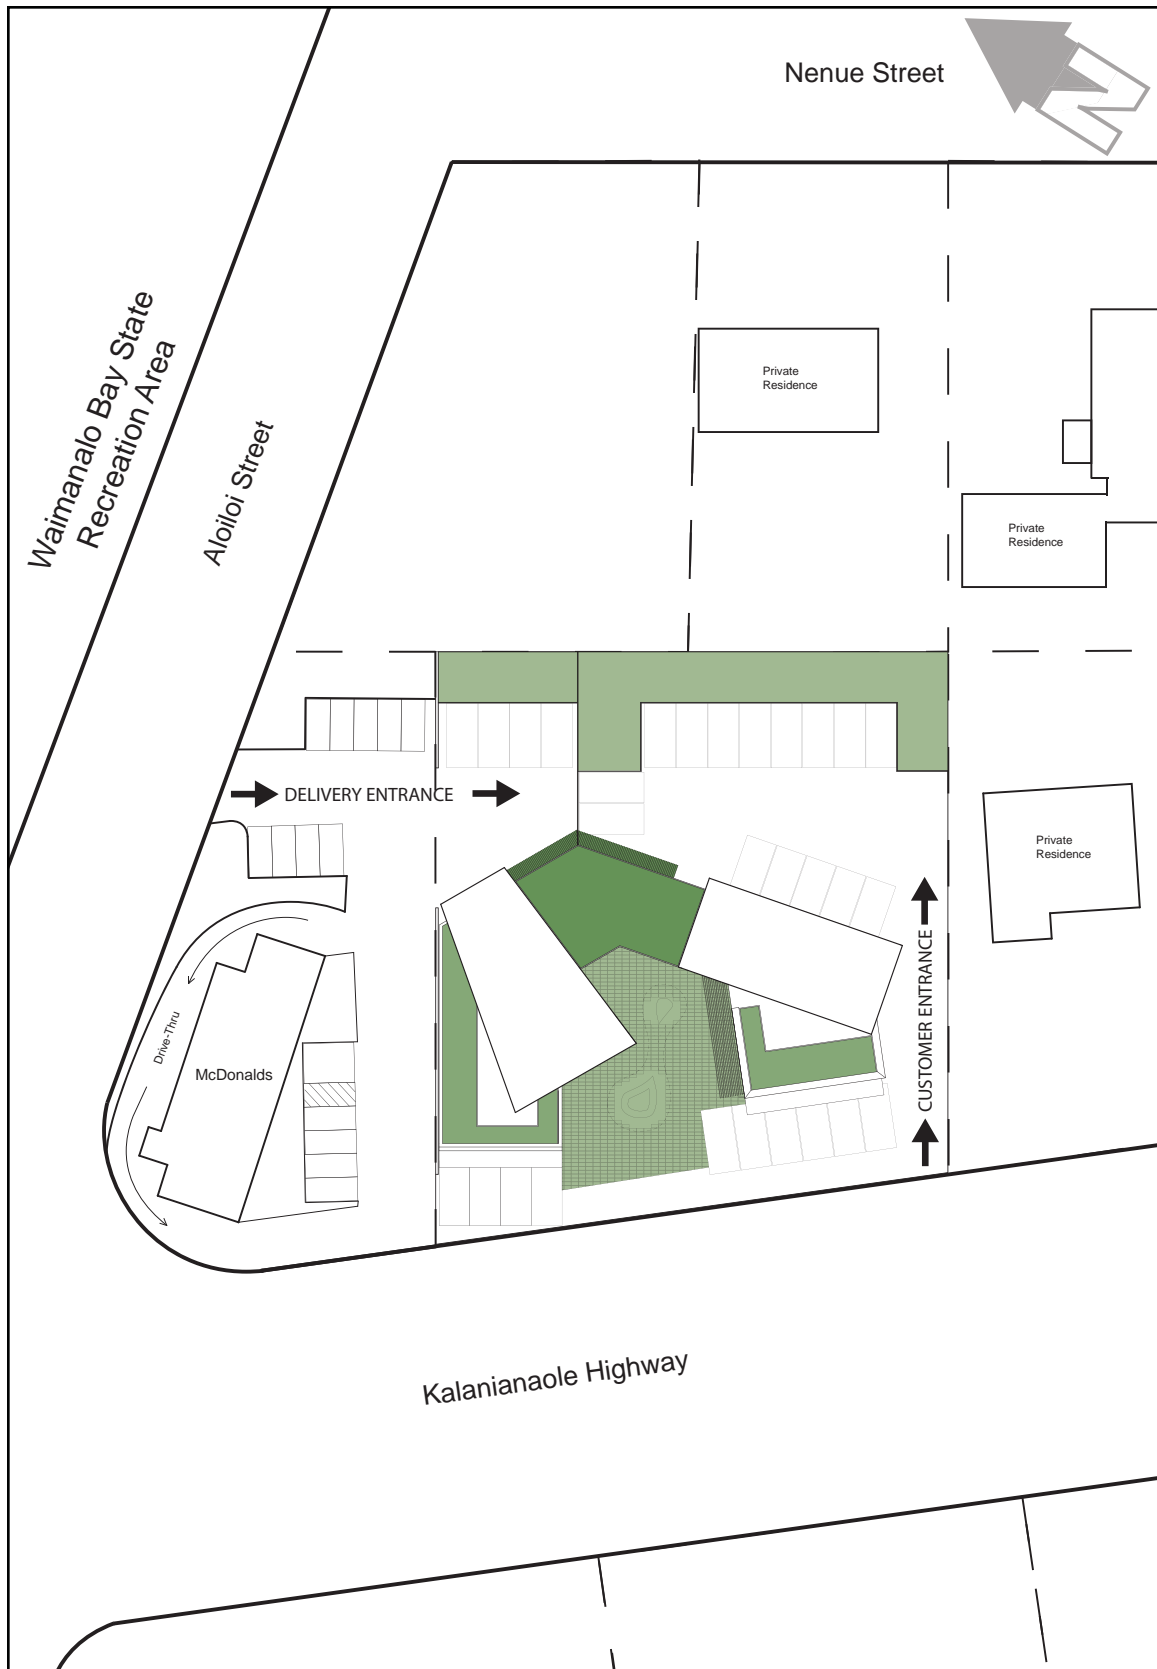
COMMERCIAL DESIGN - FIRST FLOOR PLAN
